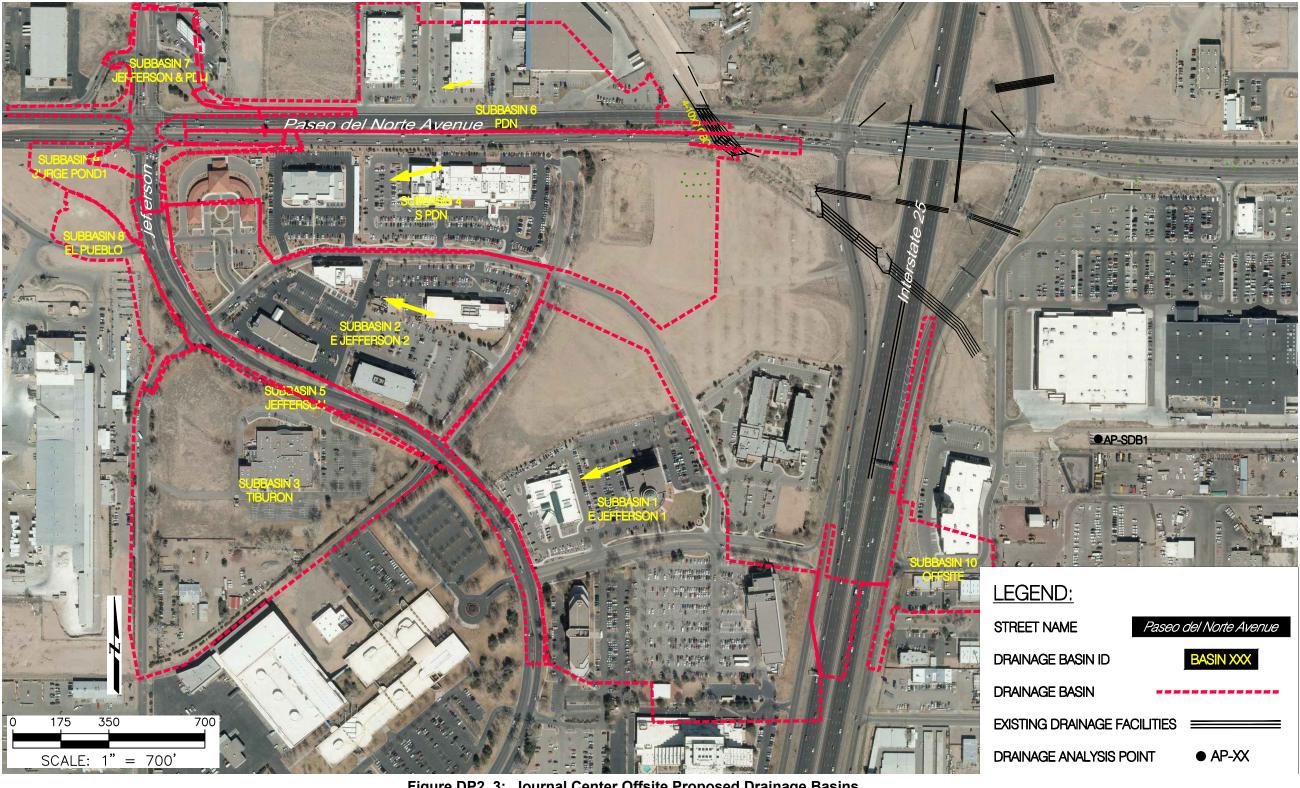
3: Journal Center Offsite Proposed Drainage Basins
